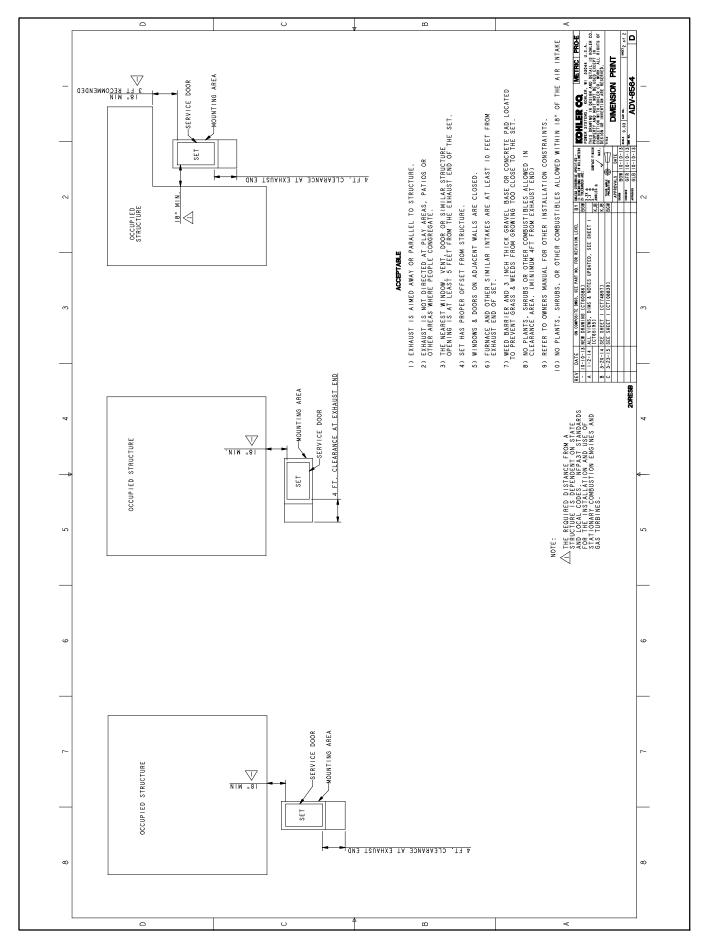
Dimension Drawing, 20RESB, ADV-8564, Sheet 2 of 2
